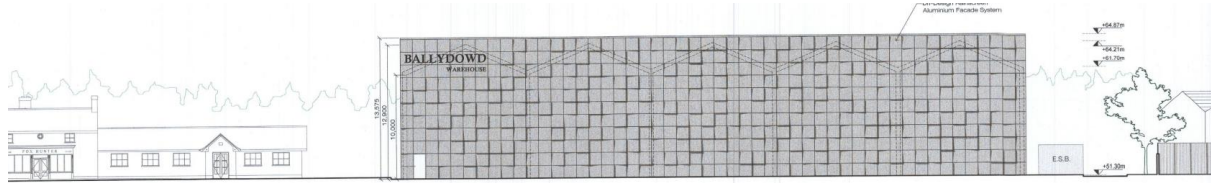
Extract of proposed north elevation of warehouse which is significantly taller than surrounding dwellings.
